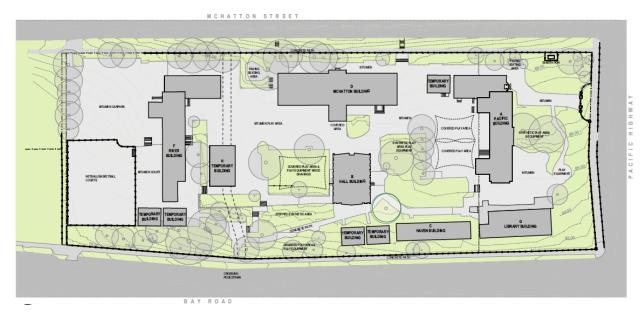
Extract of existing site plan (Source: Fulton Trotter)
